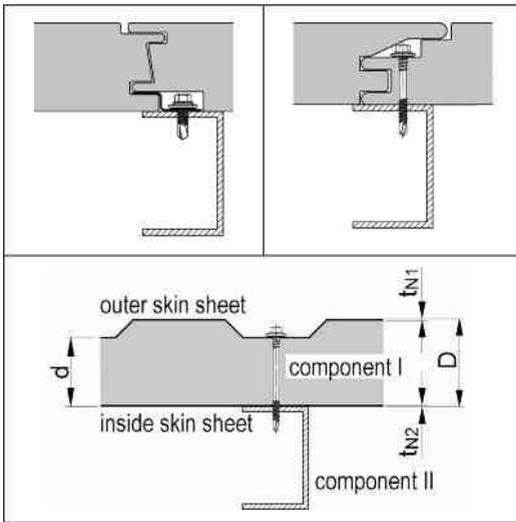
Methods that can, in principle, be used to fasten sandwich panels
